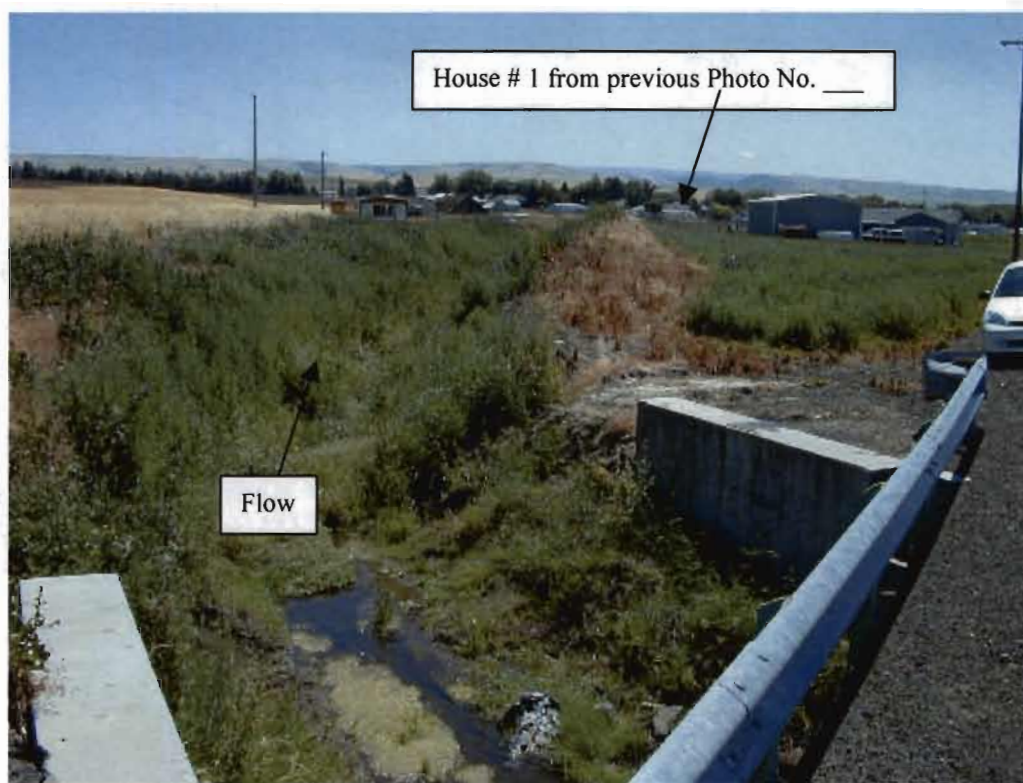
View looks downstream at Waterman Creek/Gulch bridge north of town.
